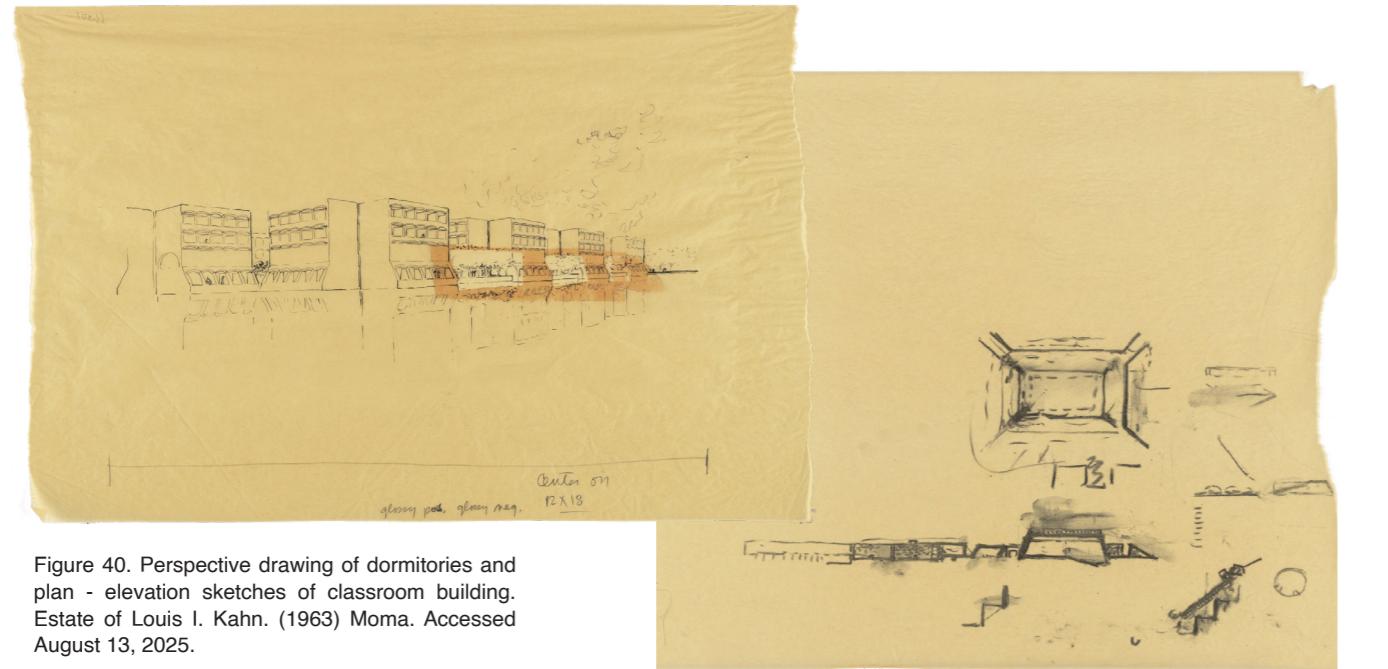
Perspective drawing of dormitories and plan - elevation sketches of classroom building. Estate of Louis I. Kahn. (1963) Moma. Accessed August 13, 2025.
